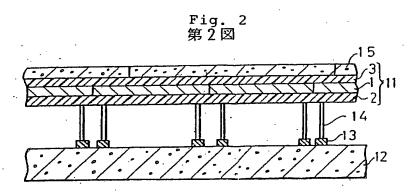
is a cross sectional pattern view showing a floating floor assembled by using the sound insulating floor material of Fig. 1.
